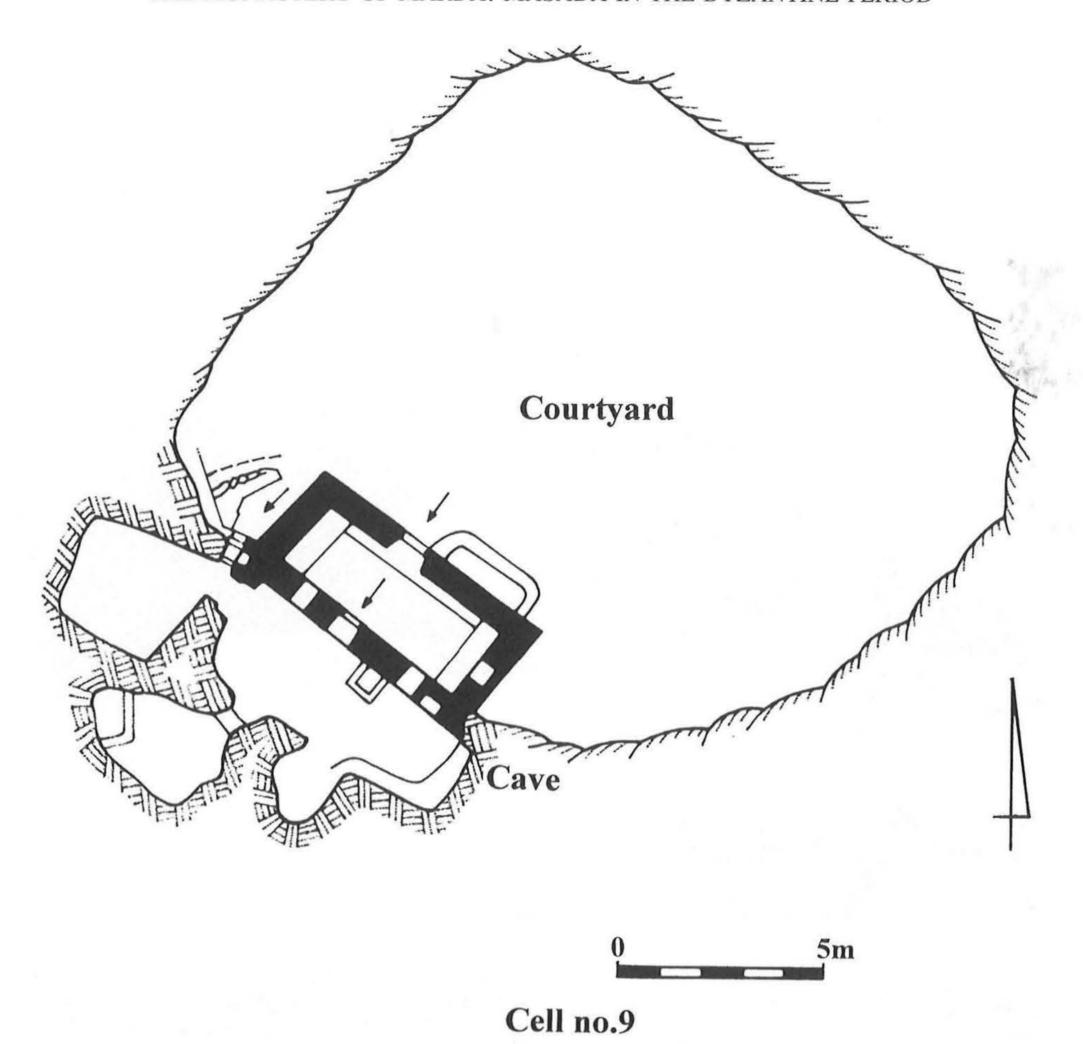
Plan of Cell 9 built into a cave (after Masada III, Plan 33).
